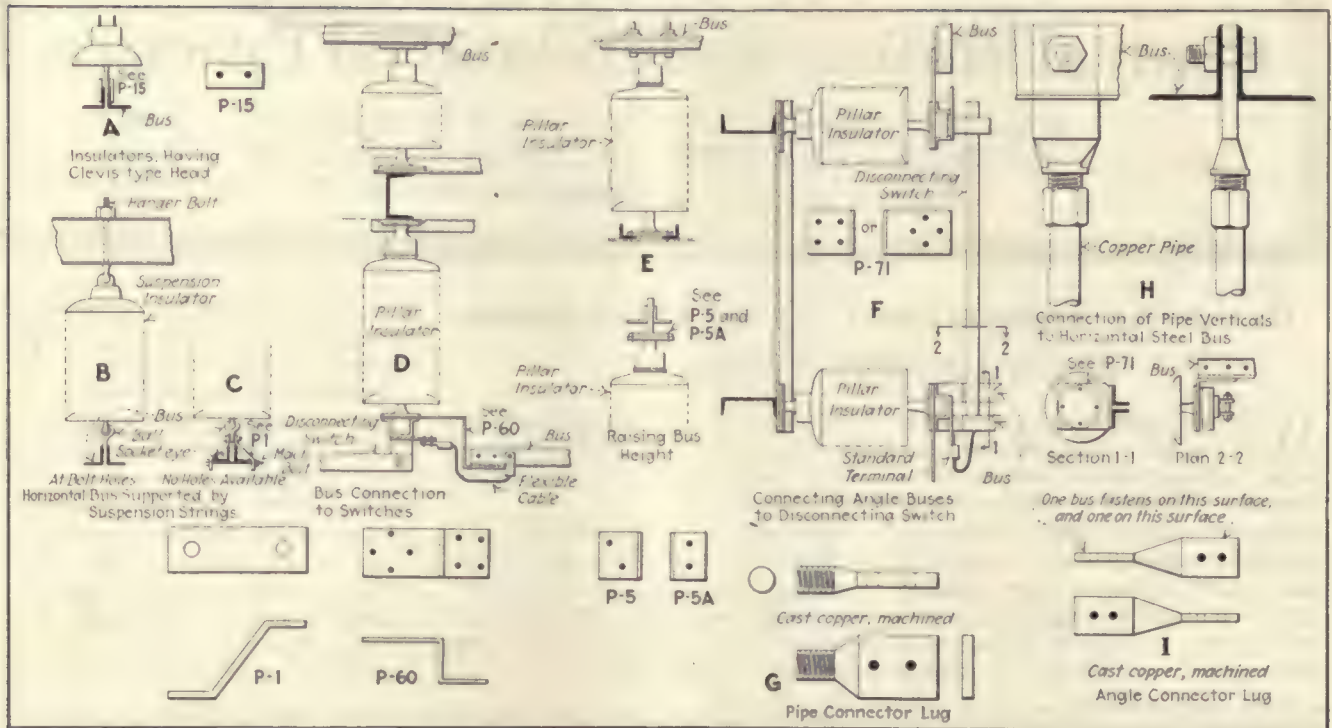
DETAILS OF JOINTS AND CONNECTIONS USED IN STEEL BUS SUBSTATION
